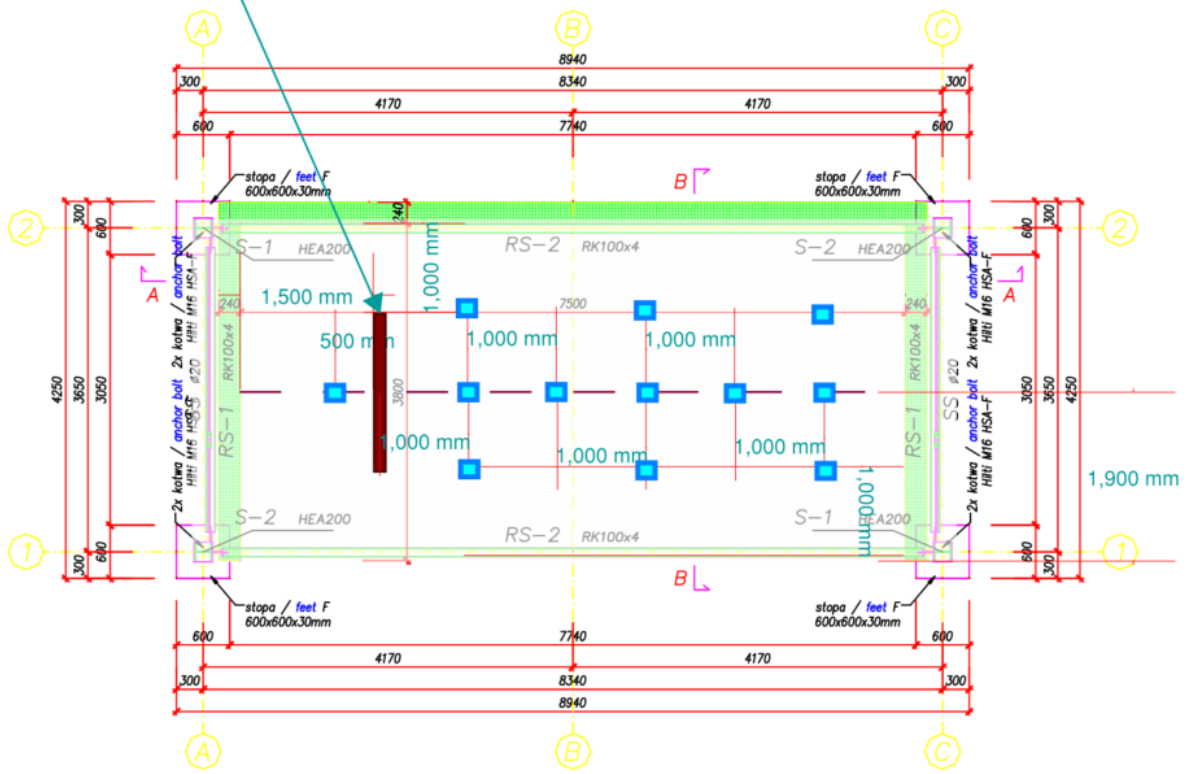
Rig floor plan showing offset propane burners and ceiling arrangement of plate-thermometers.
